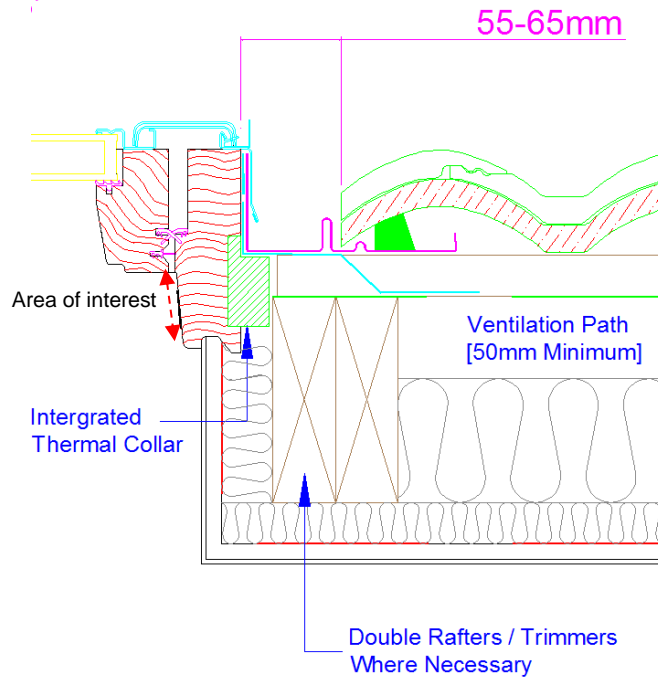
Right hand side of roof window/jamb detail with Keylite Thermal Collar. Area of interest indicated by dashed red arrows.
